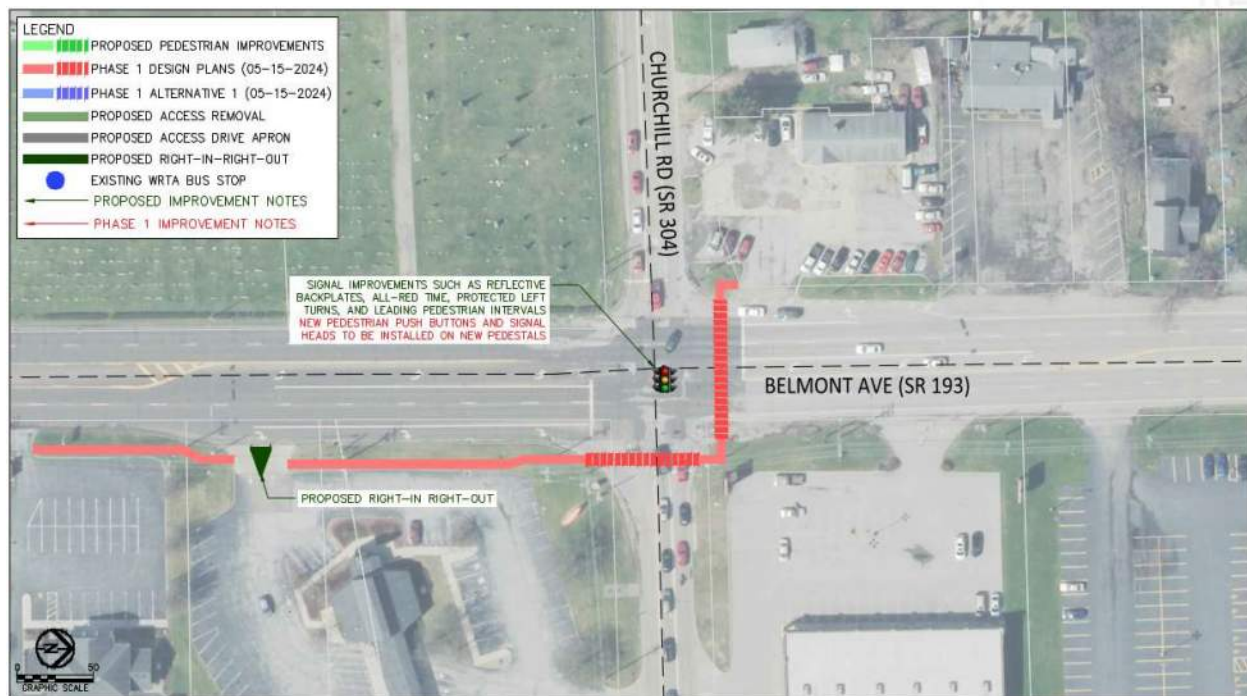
Proposed conditions, from the cemetery to Churchill Road
